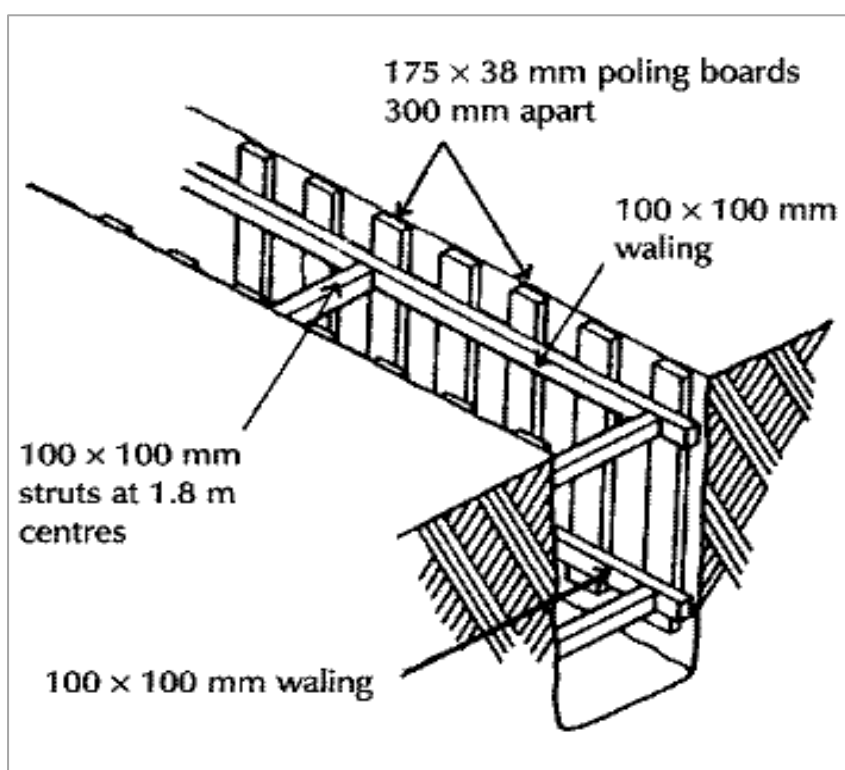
Typical 220 kV Excavation for Concrete Duct
